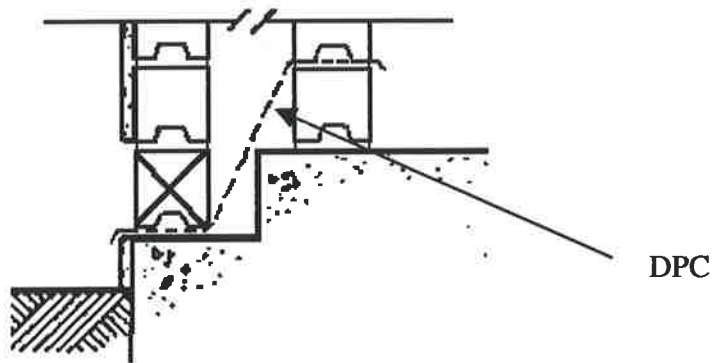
URM Wall to Ground Floor Slab DPC Connection Detail
